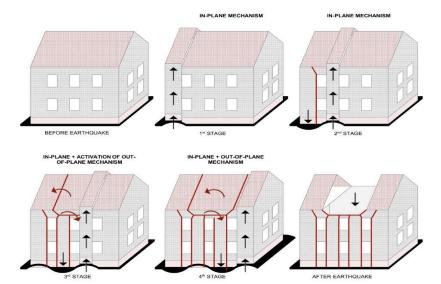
Particular combination of in-plane and out-of-plane failure mechanism for masonry building in the epicentre of shallow earthquakes [174]
